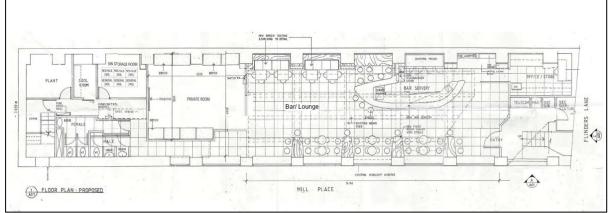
Proposed Layout Plan which is request to be updated only to allow for the removal of the texted highlighted in yellow.
